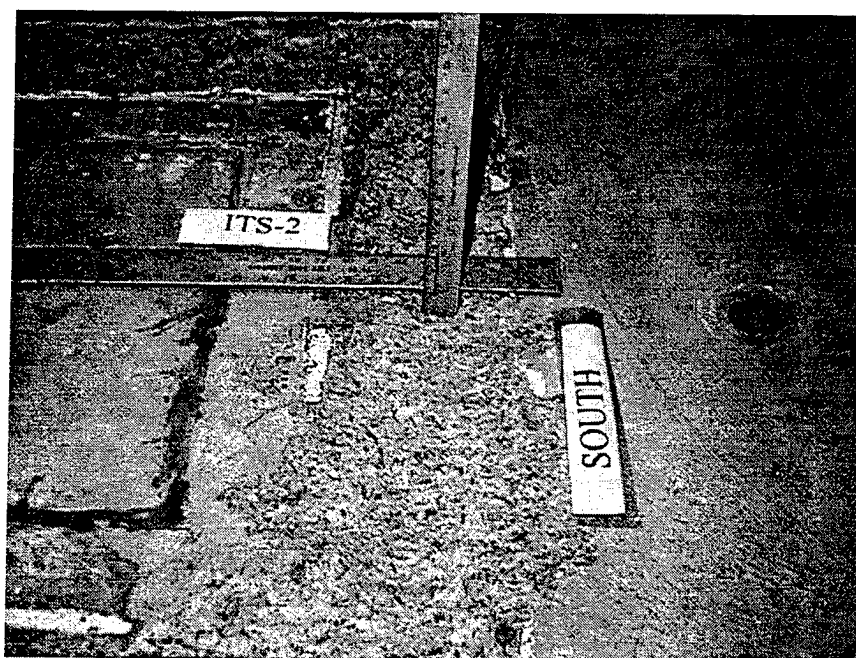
Close-up view of failure plane under south wall of ITS-2.
